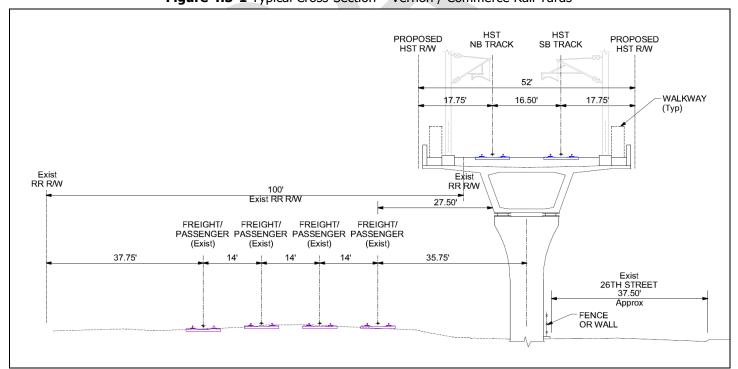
Typical Cross-Section – Vernon / Commerce Rail Yards
